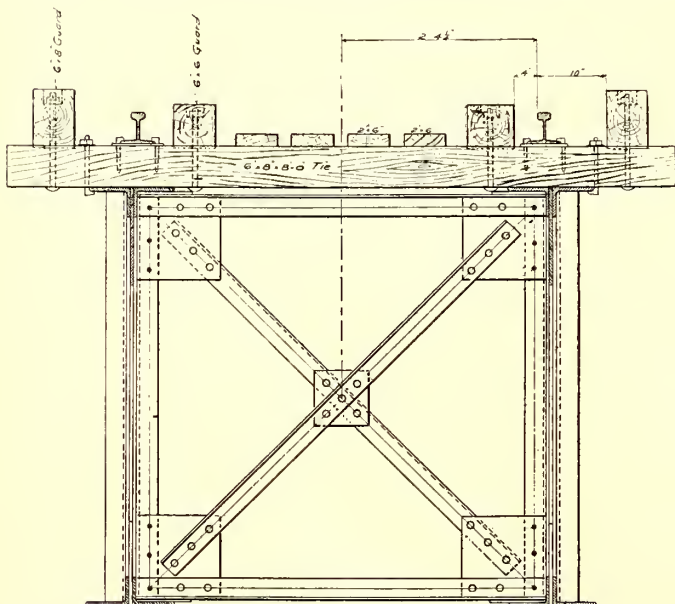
TRANSVERSE SECTION OF PRESENT TYPICAL LOOP SPAN
